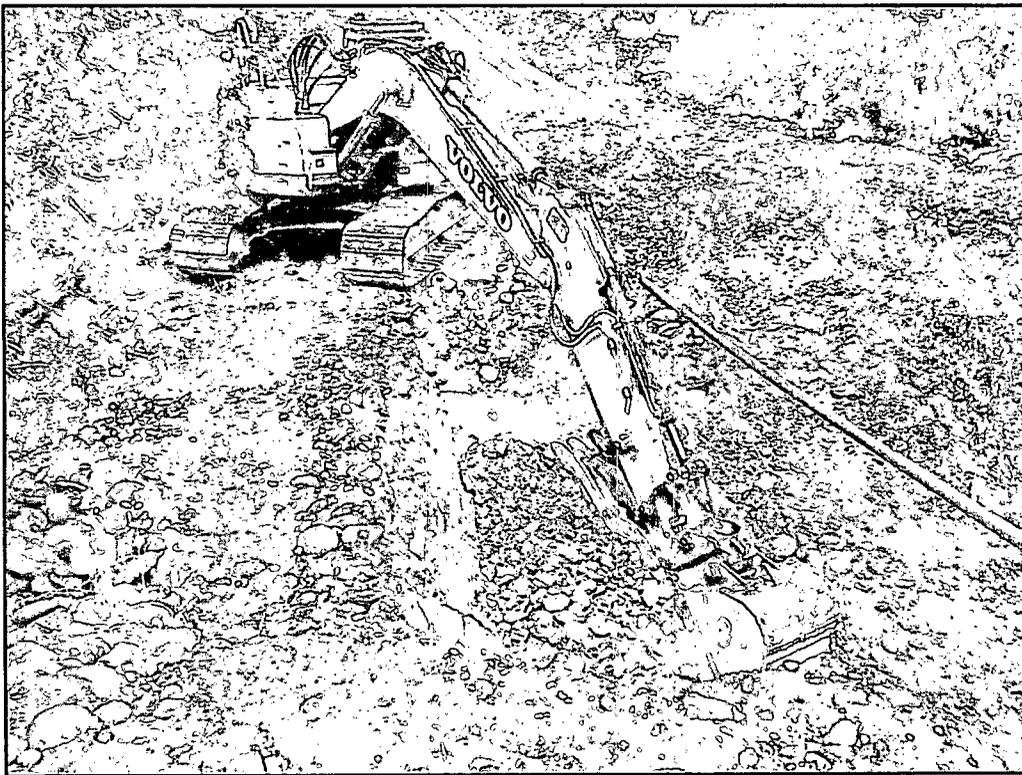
Excavation along the southwest portion of the pipeline remediation excavation, facing north.
